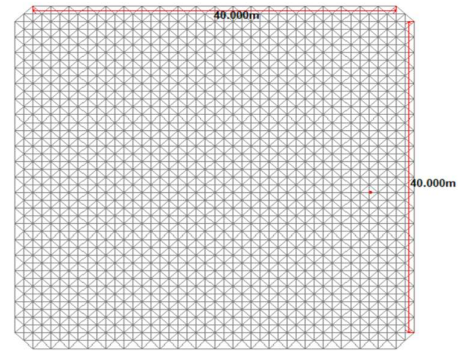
Plan View of Existing Space Frame; Line Model of APSC over an Area of 40m x 40m.
